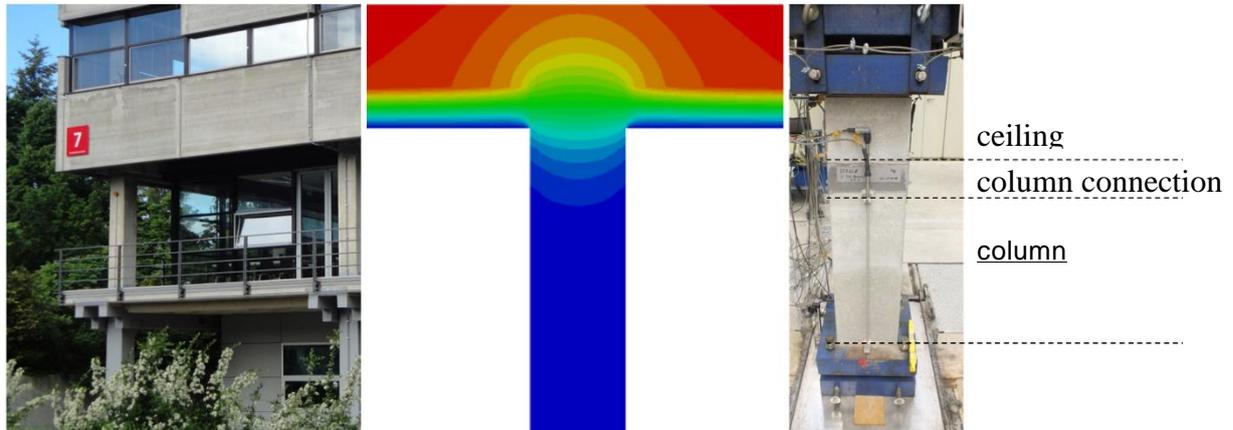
Building with columns (left), thermal modelling (center) and test specimen (right)
